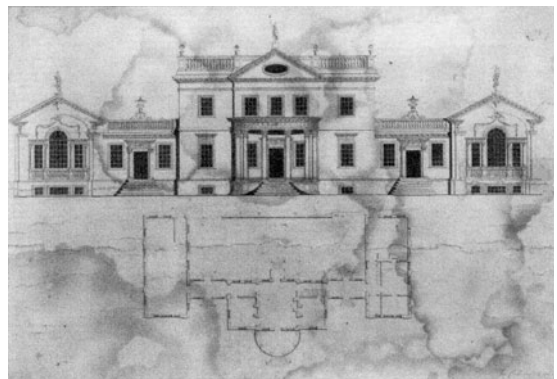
Joseph Clarke's elevation and plan of the 1792 House at Wye Hall Plantation. (Courtesy of the Maryland Historical Society, Baltimore, MD.)
